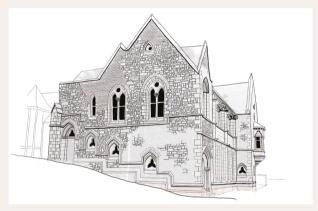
Perspective of Bellamy's illustrating selective reconstruction with new masonry. Drawing: Tanya Bezuidenhout
